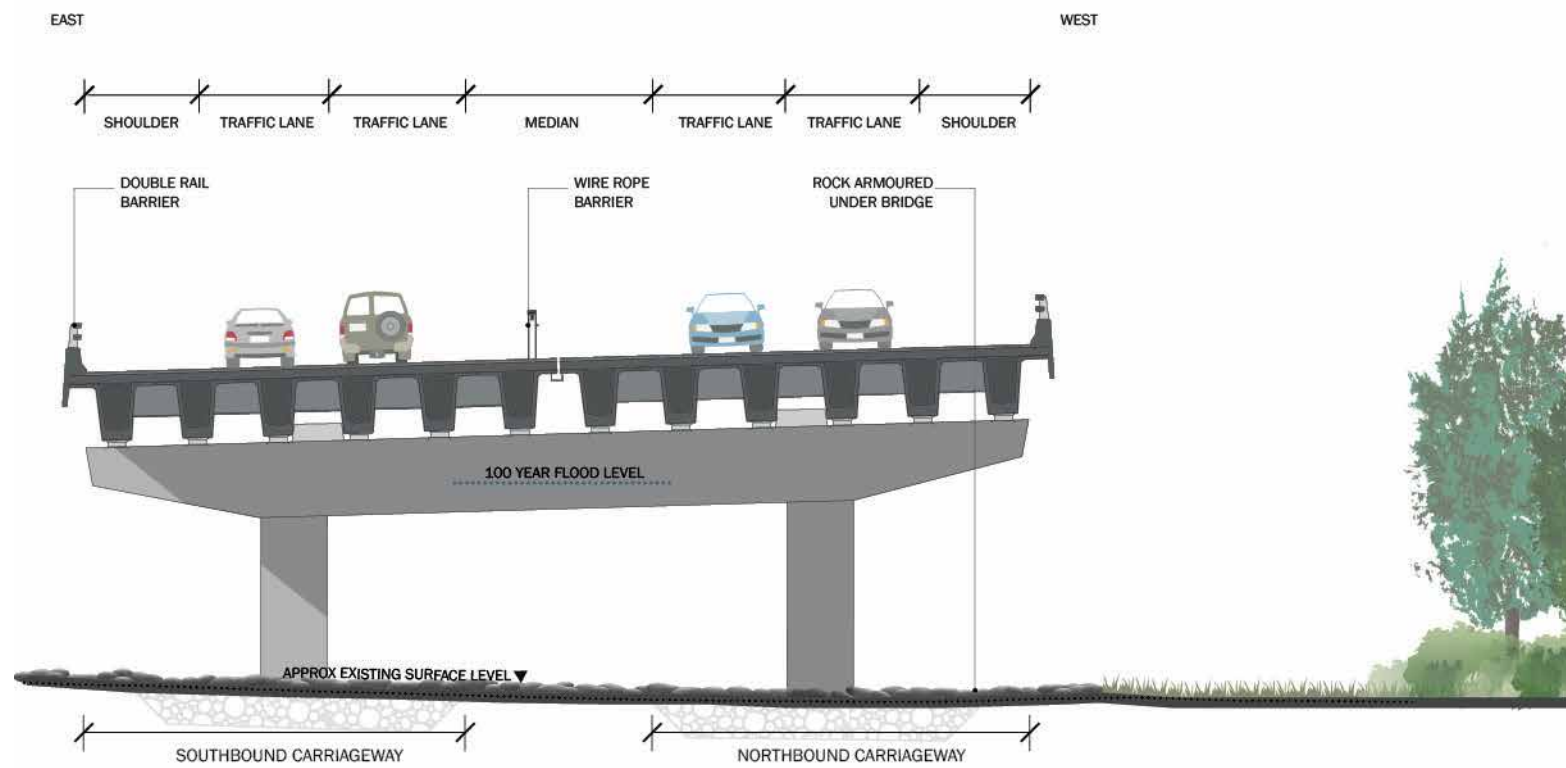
Section – Bridge SB02: Broughton Creek Bridge No.1 (Scale: 1:200@A3)
